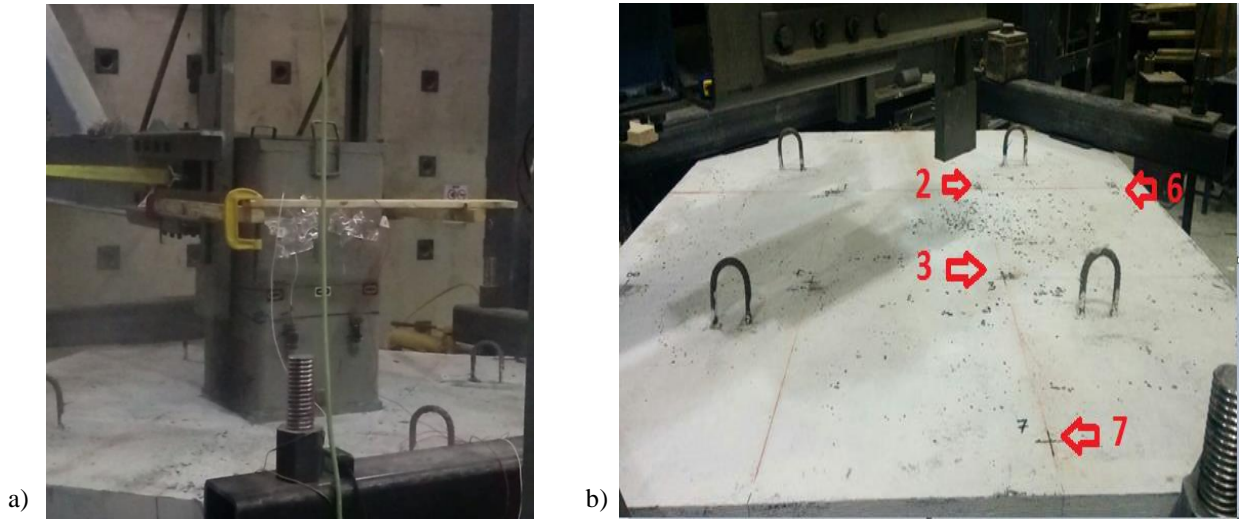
Test site a) Impact load view b) Locations of accelerometer
